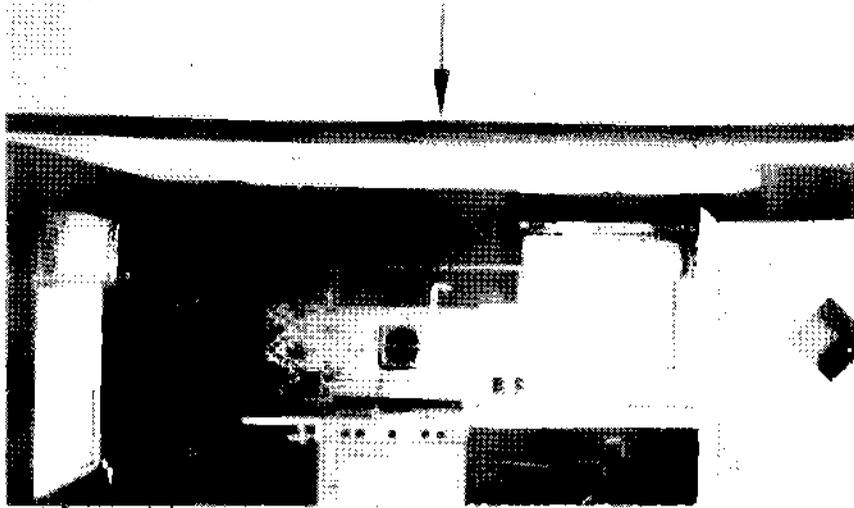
Failure of Ceiling/Roof Truss Attachment
